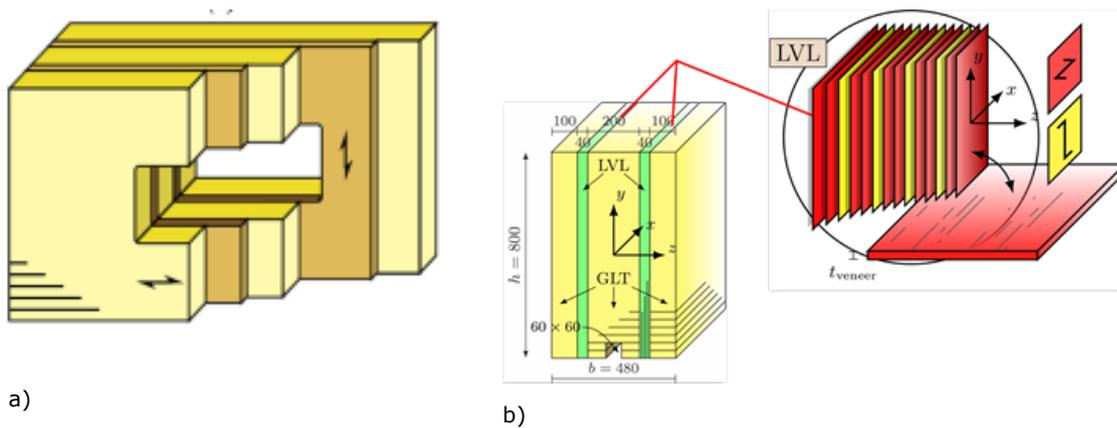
a, b: Internal reinforcement of softwood GLT beams by internal vertically arranged beech LVL plates
